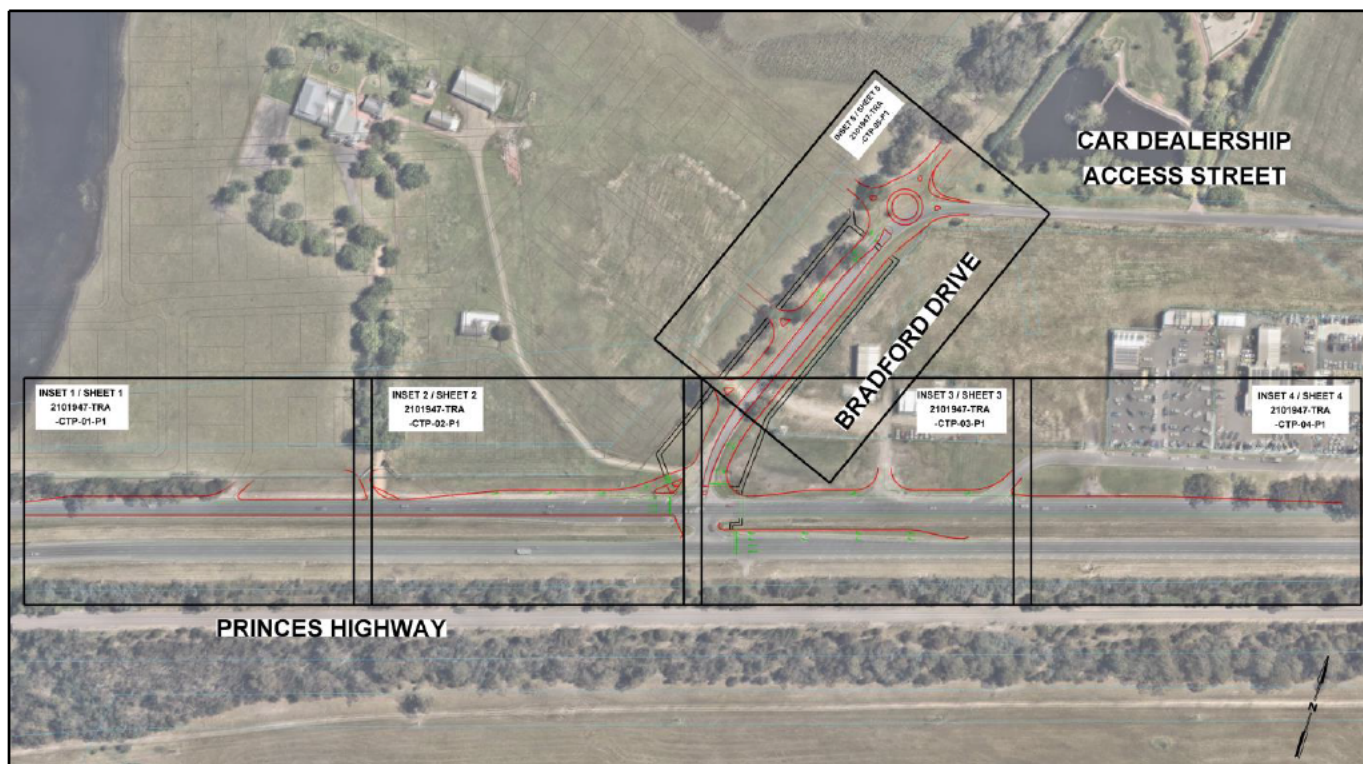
Princes Hwy / Bradford Dr signalised intersection concept plan (excerpt) (Source: Beveridge Williams)
